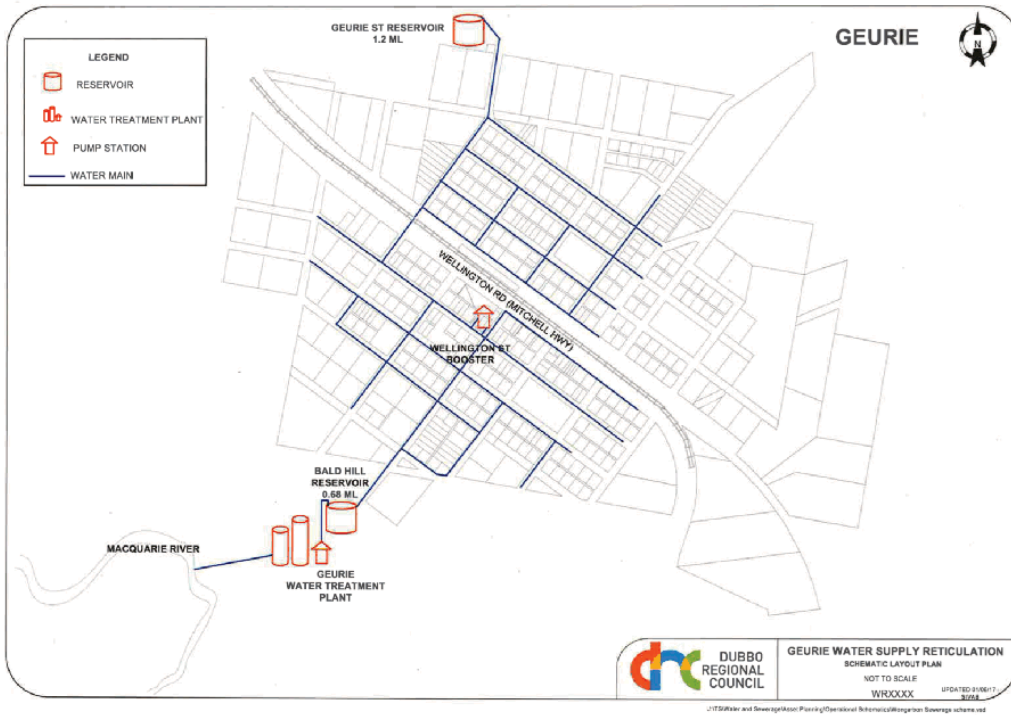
GEURIE WATER SUPPLY RETICULATION SCHEMATIC LAYOUT PLAN
